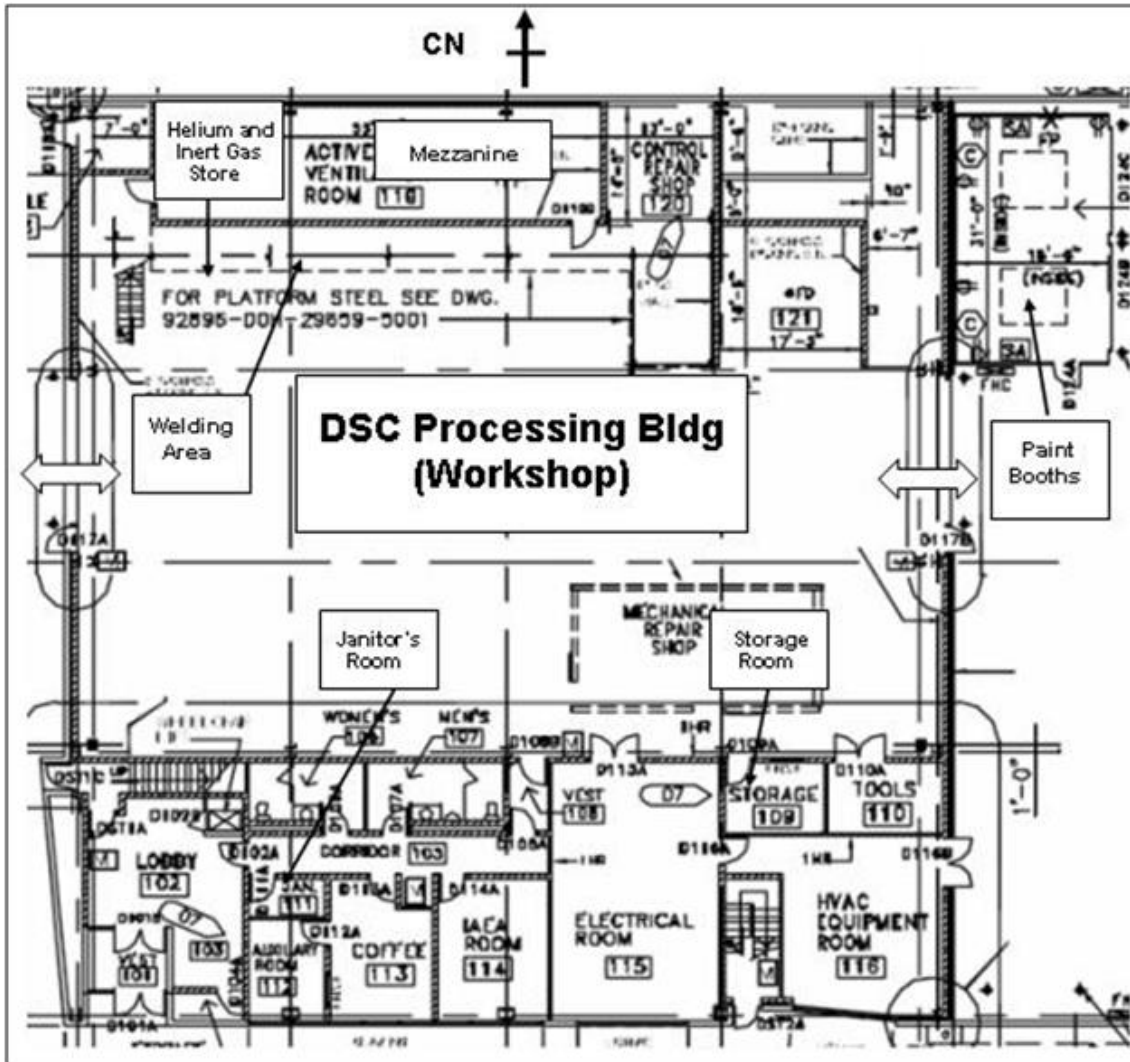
Layout of the Phase I DSC Processing Building (Workshop)
